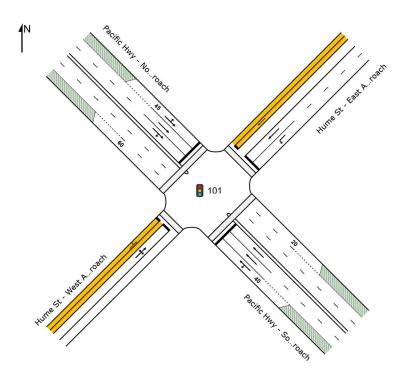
Intersection layout of Pacific Highway/ Hume Street intersection
